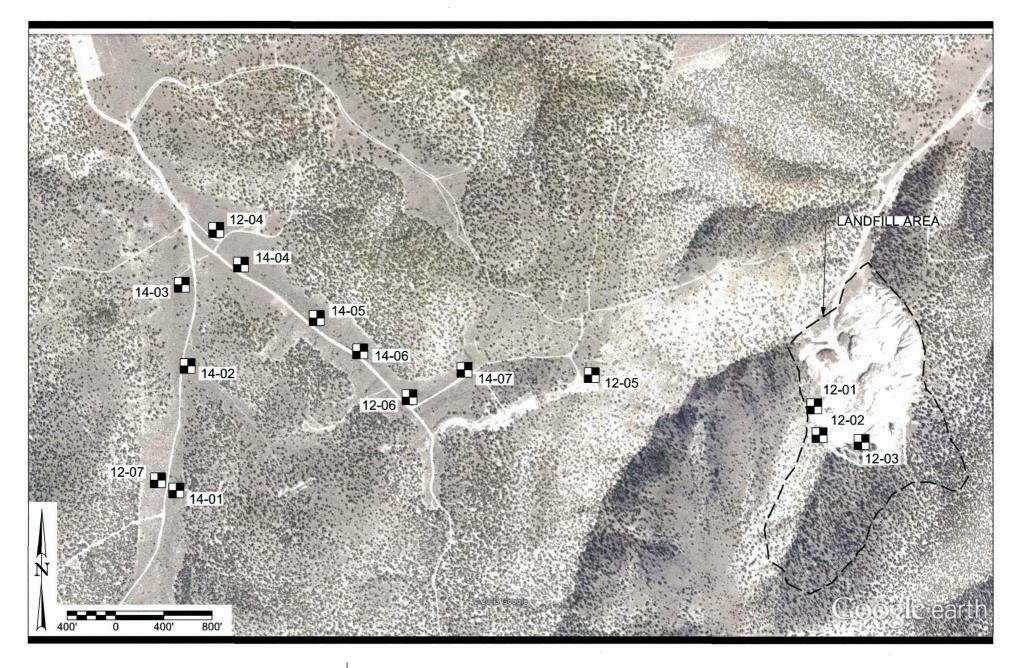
SITE PLAN & TEST HOLE LOCATIONS
